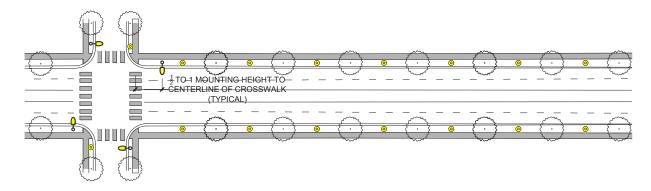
Typical Collector Street with Continuous Pedestrian Lighting
